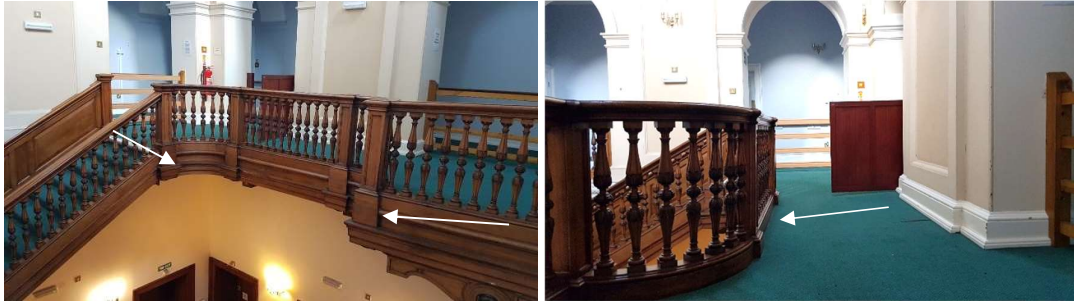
Cranked geometry of balcony elements towards centre of stairwell. Notice the shadow below the open halfdoor.
